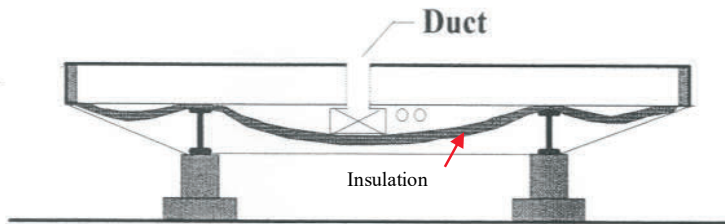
Insulation on bottom of floor cavity – floor joists running width of mobile home
